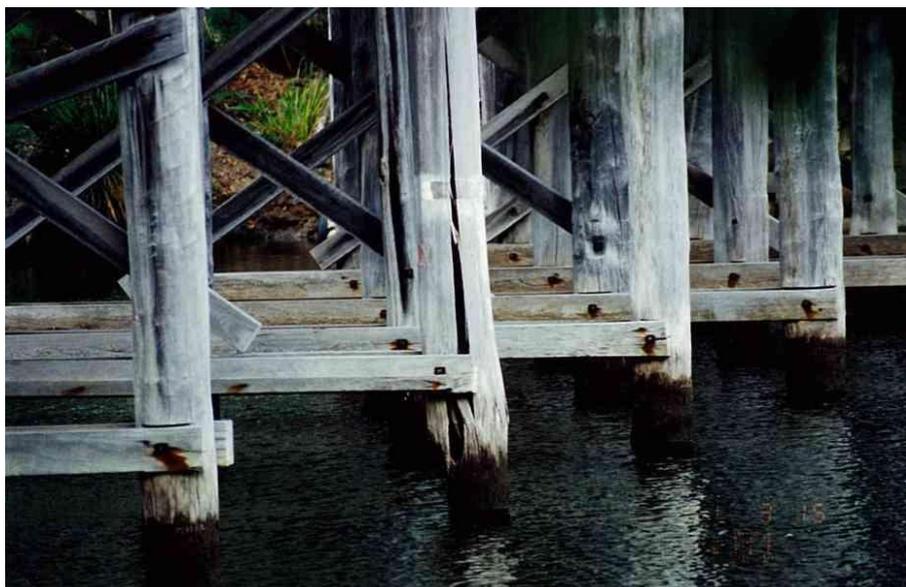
EXAMPLE OF SPLIT TIMBER PILE
